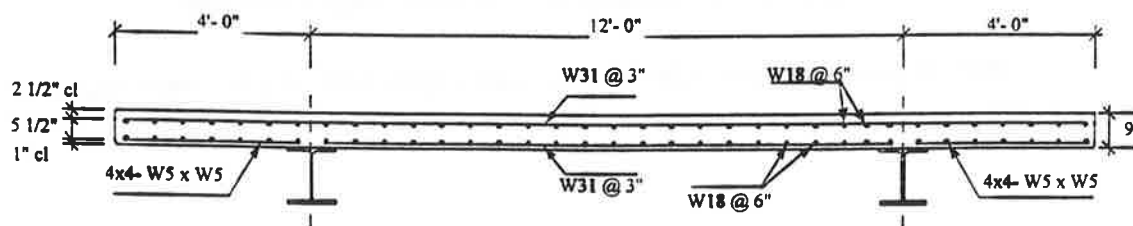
Full-Depth Cast-in-Place Deck System With Welded Wire Fabric
